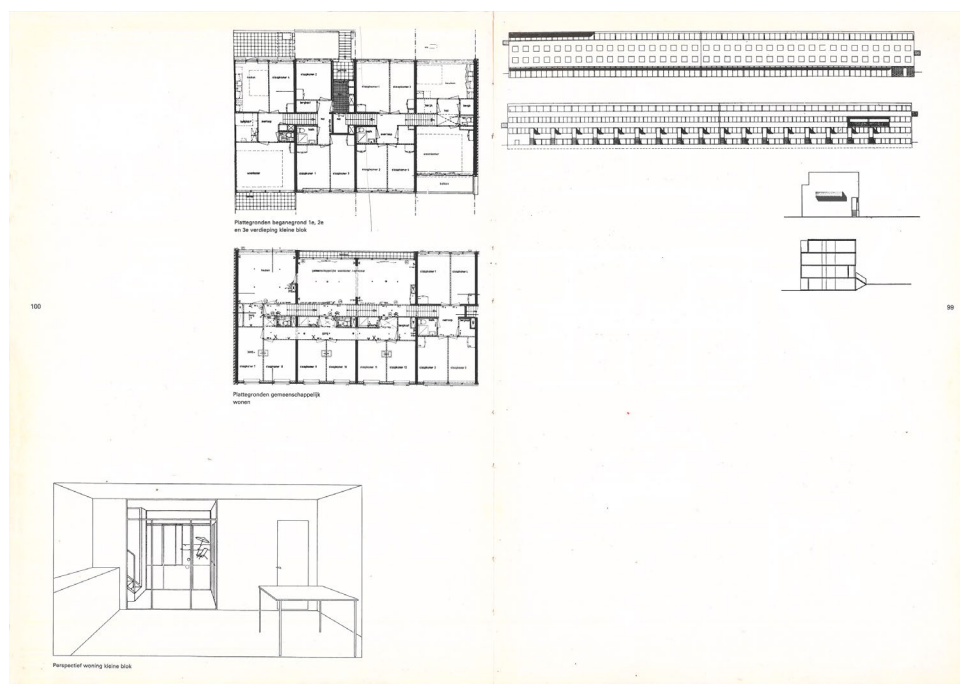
Plans of the Oost III short block. On the left page, the floor plans of the communal living, and the floor plans of the maisonnettes, and an interior perspective. On the right page, the façades. *IJ-plein Amsterdam. Rem Koolhaas / OMA*. Rotterdam: Uitgeverij 010, 1989.
